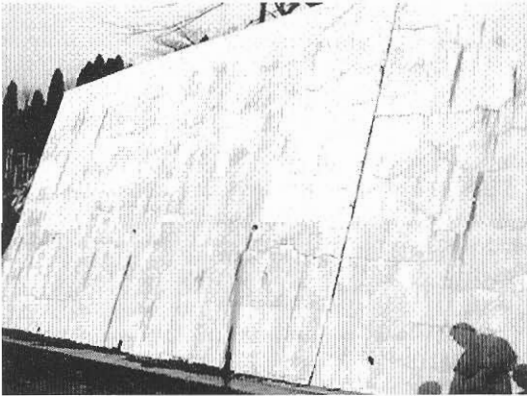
Repair of an ASR damaged earth-retaining wall with a sprayed ECC, Gifu, Japan (Courtesy: K. Rokugo).
